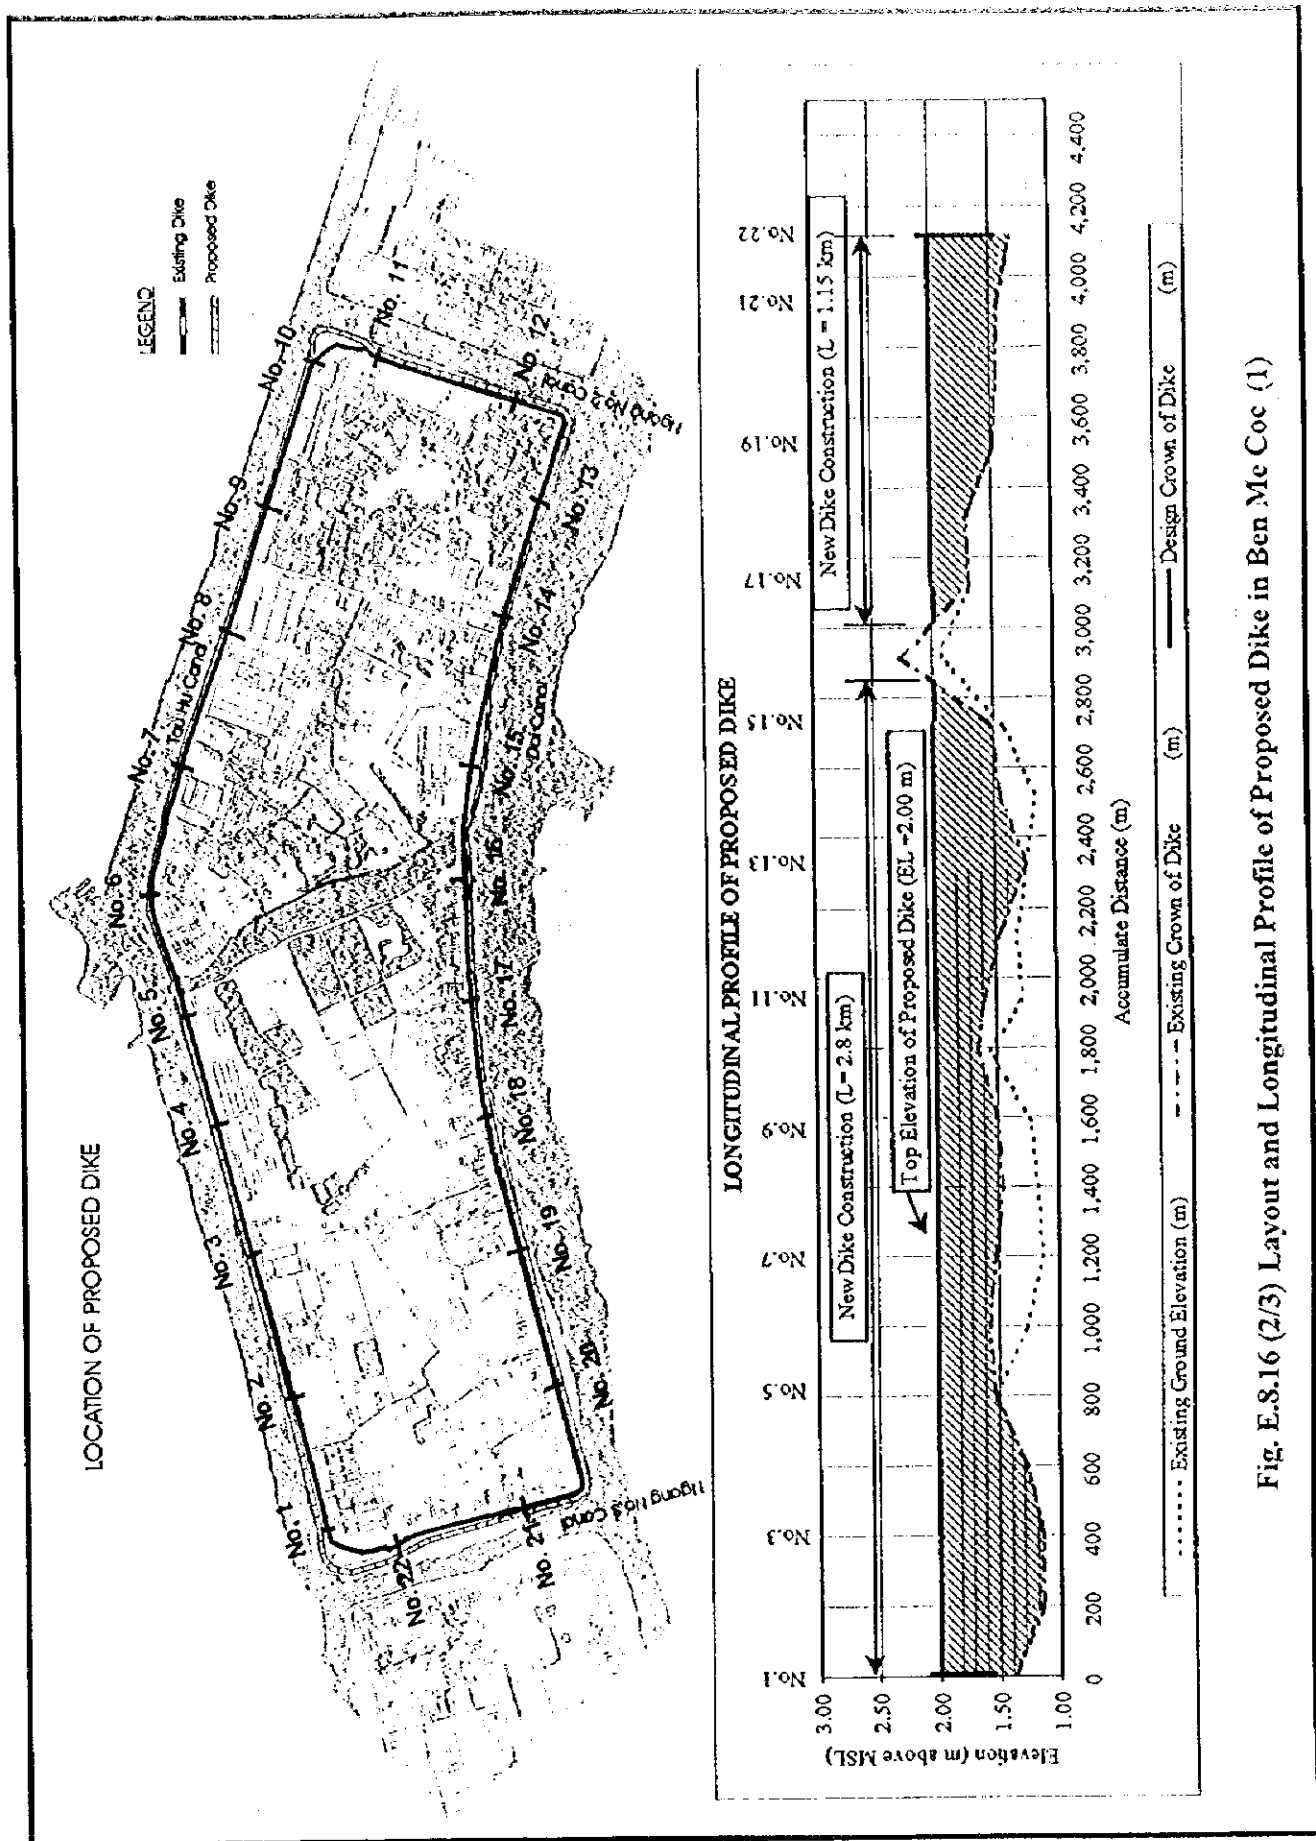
(2/3) Layout and Longitudinal Profile of Proposed Dike in Ben Me Coc (1)
